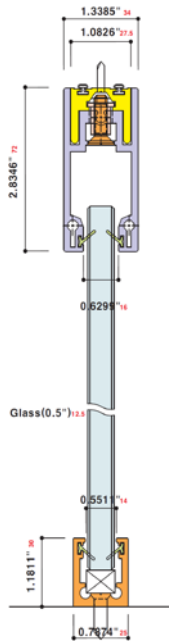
TYPICAL CROSS-SECTION OF GLAZED WALL PANEL
